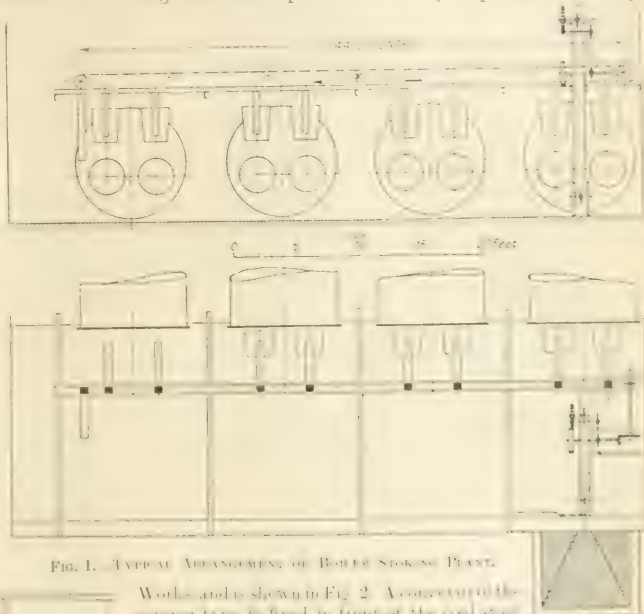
TYPICAL ARRANGEMENT OF BOILER STOKING PLANT.
